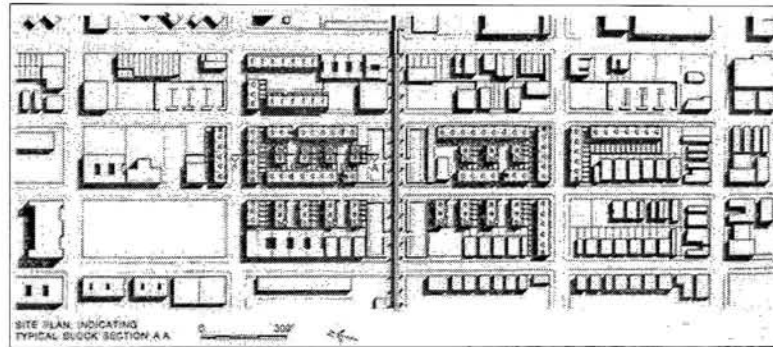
Marcus Garvey Park Village, Brooklyn, Site Plan.
